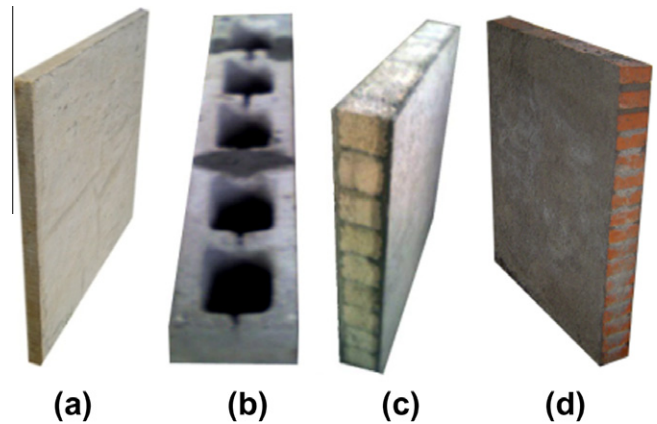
Materials used for thermal conductivity tests: (a) panel wall of ferrocement, (b) panel wall of hollow concrete block, (c) panel wall of lightweight concrete brick, and (d) panel wall of red clay brick.
